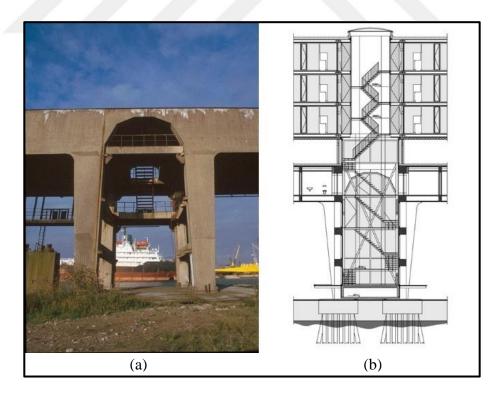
Existing structure of the craneway was used as foundation for the new office building, Kraanspoor, OTH Architecten, 2007. (a) Existing structure, (b) Section of the office building [247]
